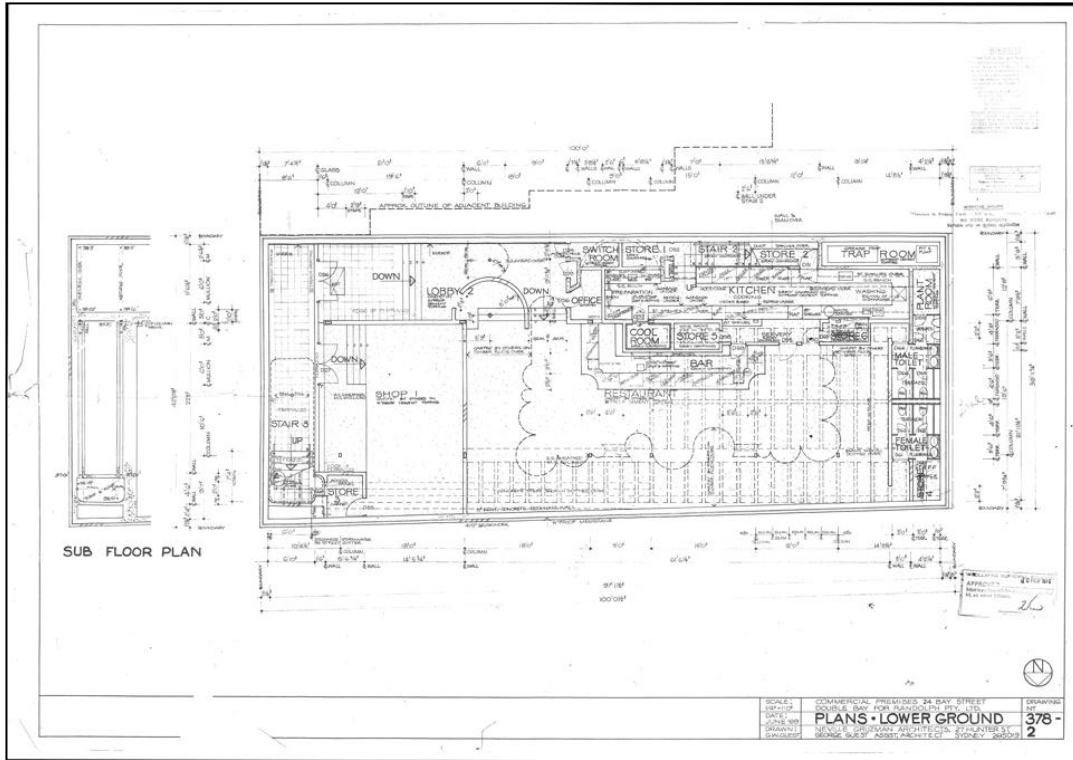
Lower Ground Floor Plan, approved by Council 10 February 1970. This plan was subject to two further amendments (see below) (Source: *Woollahra Council Archives, file 69/1507*)
